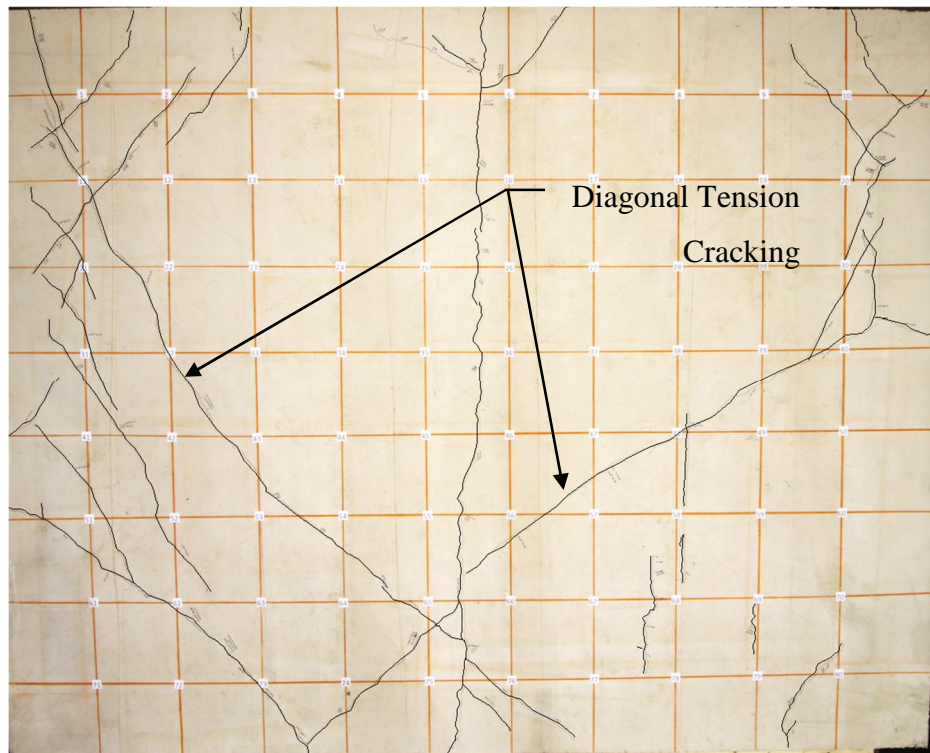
Crack Distribution of Specimen 2/4-4-L-NF-DT Diagonal Tension Cracking (Point C in Figure 3-22)
